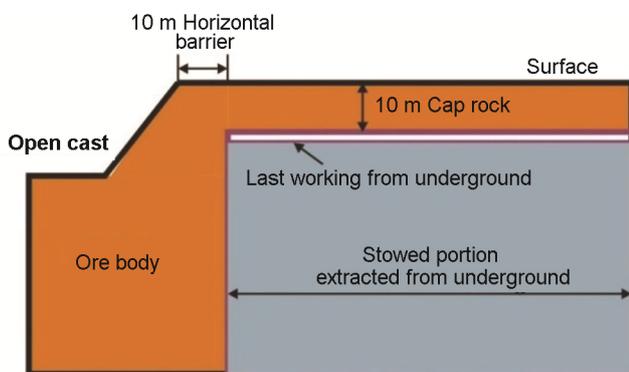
Schematic vertical section along strike showing the horizontal barrier to be left between opencast and underground workings when the same pegmatite is extracted using both the methods.
